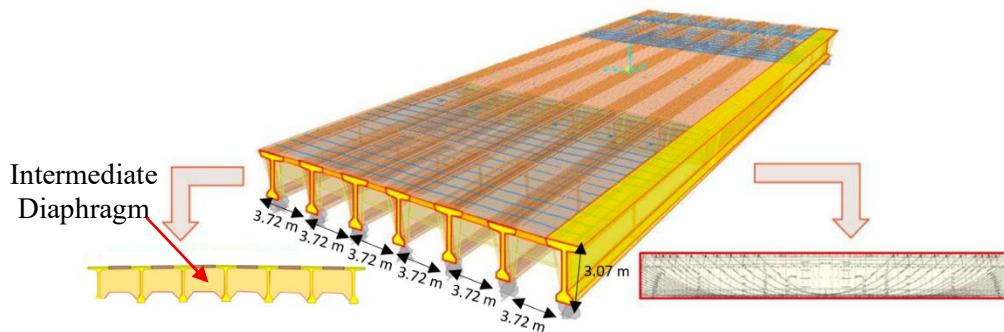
A typical approach span (sections 5 or 7) (Taylor, 2013)
